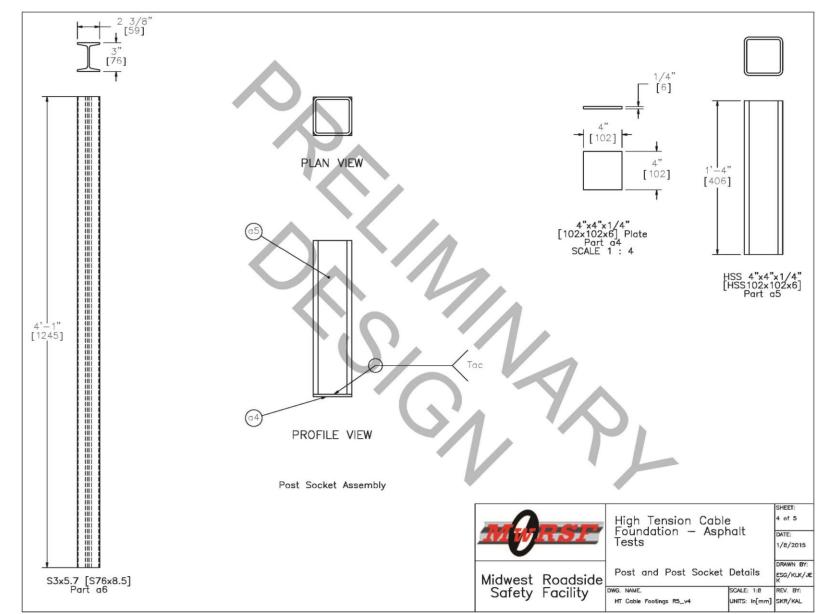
Steel Post and Socket Details, Test No. HTCB-19
